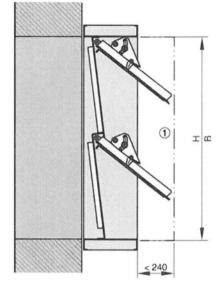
Wall installation without installation sub-frame (ARK-1 shown)
